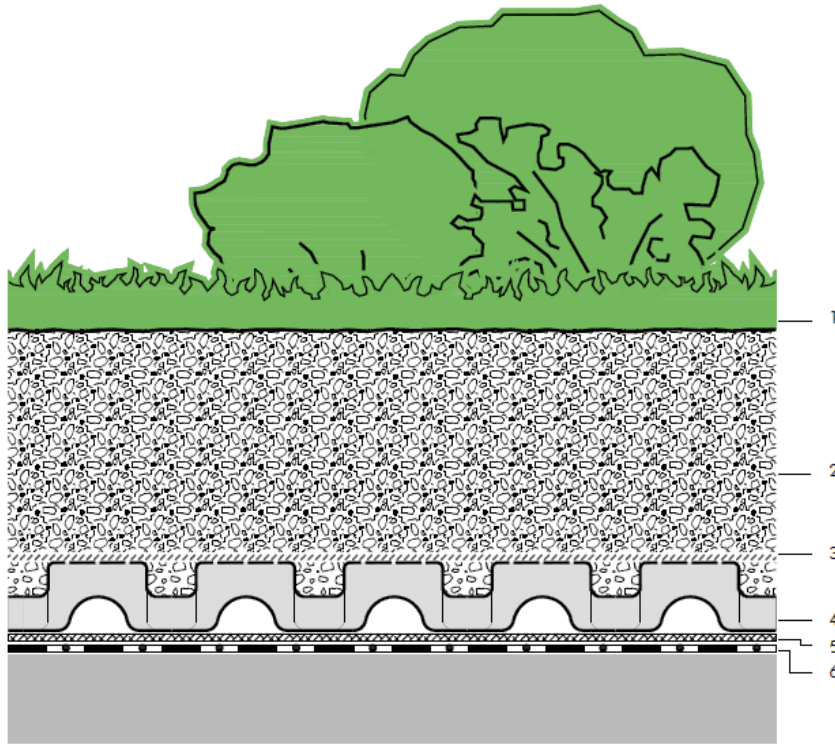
, 1. Lawn, perennials, shrubs and trees.2. System Substrate.3. Filter Sheet .4 Drainage Element . 5 .Protection Material . 6 .Roof construction with root-resistant waterproofing.
